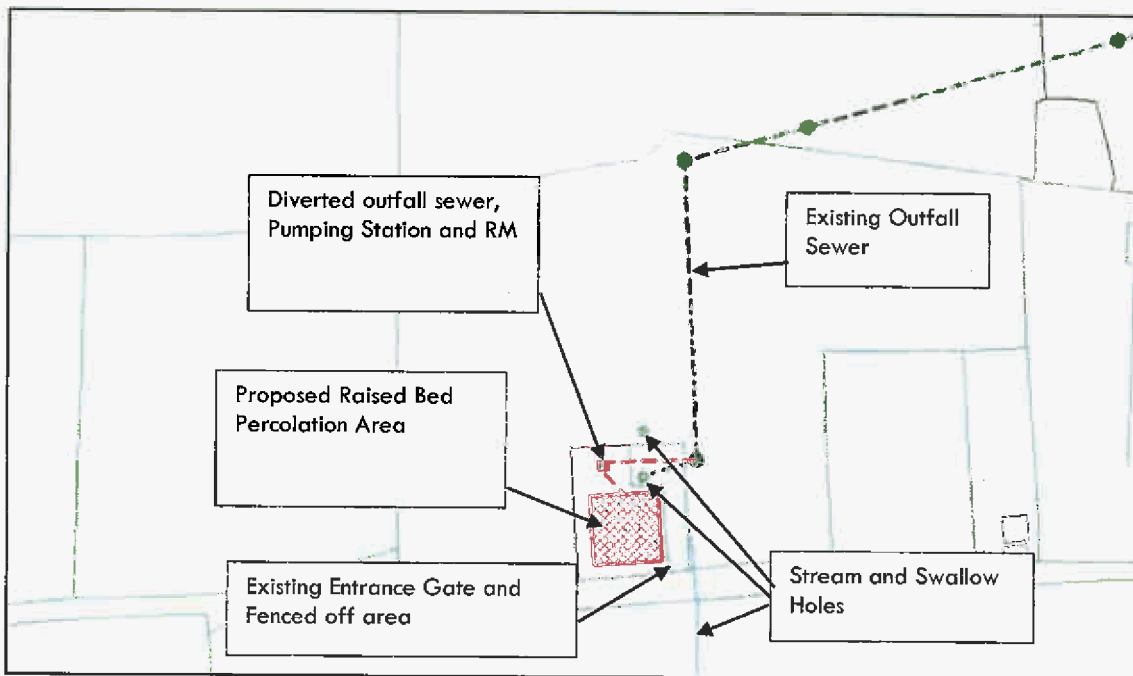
Proposed raised bed percolation area adjacent to Ballybreen Swallow Hole
